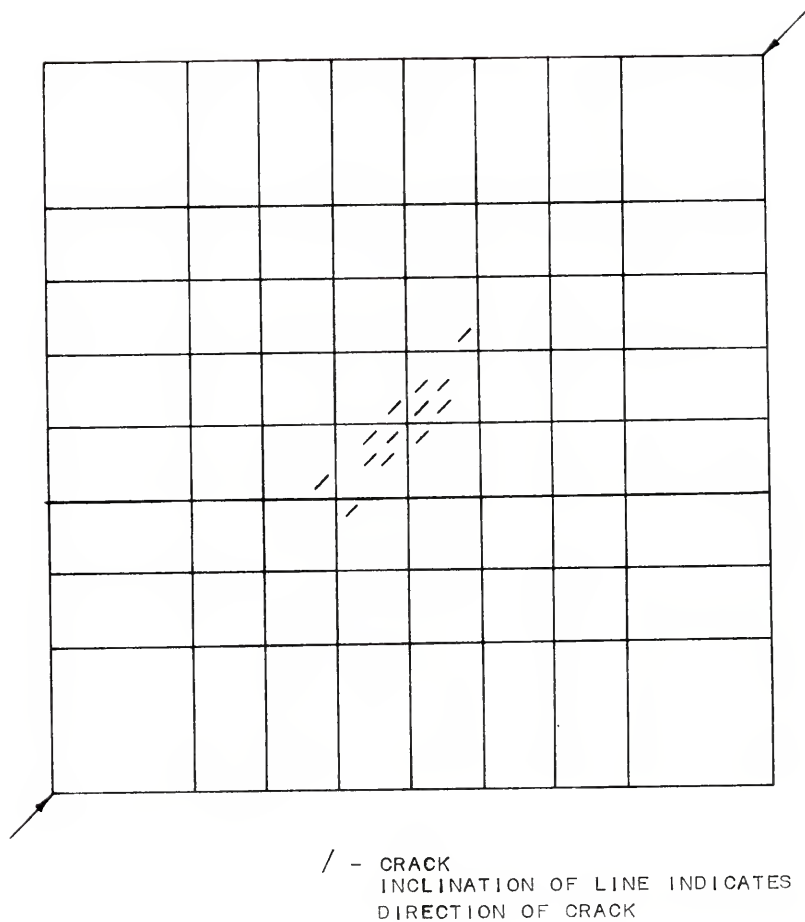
Crack pattern of square concrete panel at 197,000 lbs.
